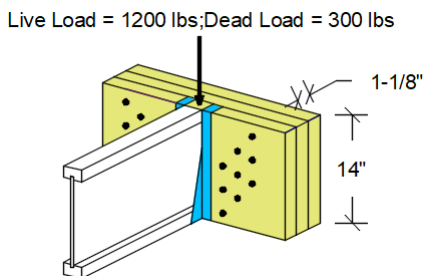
UNIFORM SIDE LOAD DESIGN EXAMPLE
